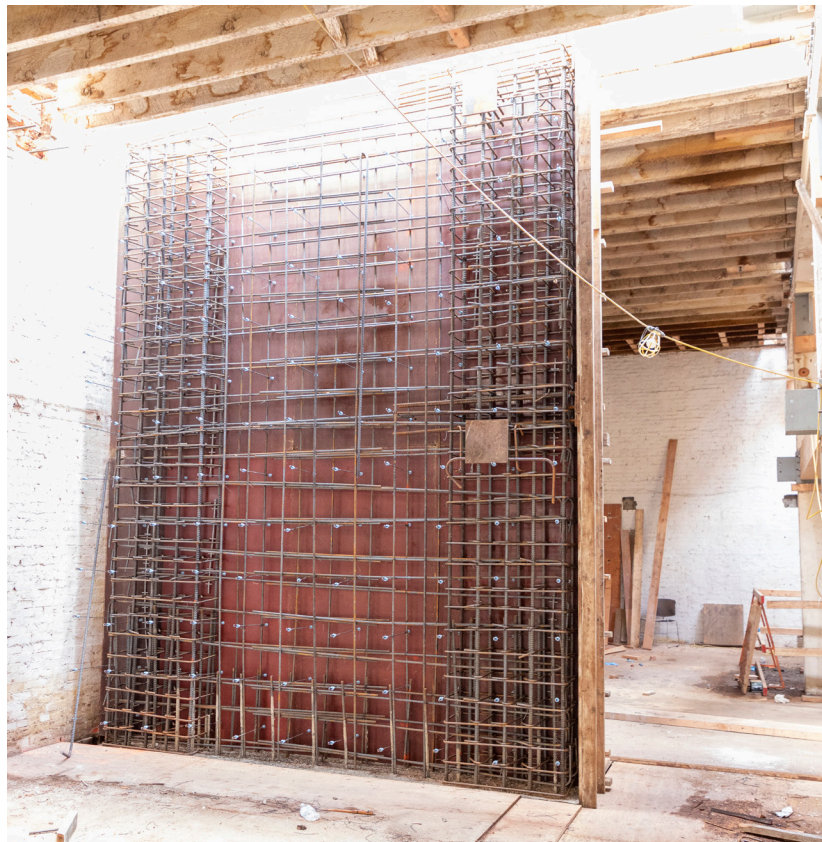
After: 2022 second floor, Shear Wall 2 steel placed.
